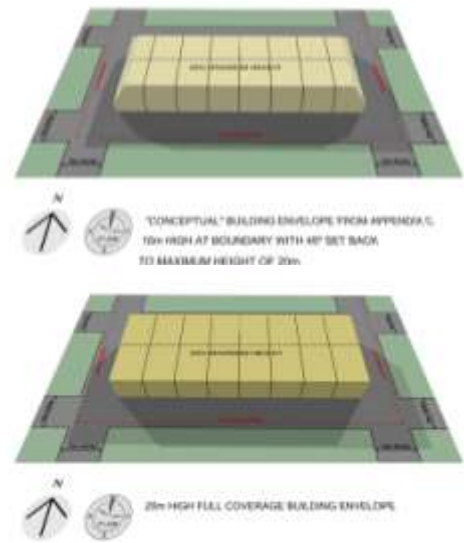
Shadows from building complying with Appendix C cover footpaths on east, west and south sides (top). Shadows from 20 metre high building are longer but shade similar footpath areas.
